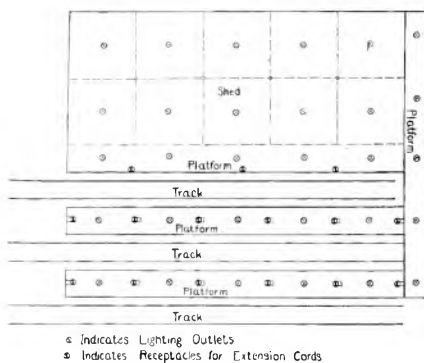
Diagram of Lighting Layout, Typical Transfer Platforms
